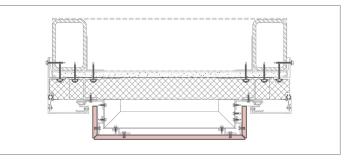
Detail of BVDC wall assembly – unitized with projected cladding detail
